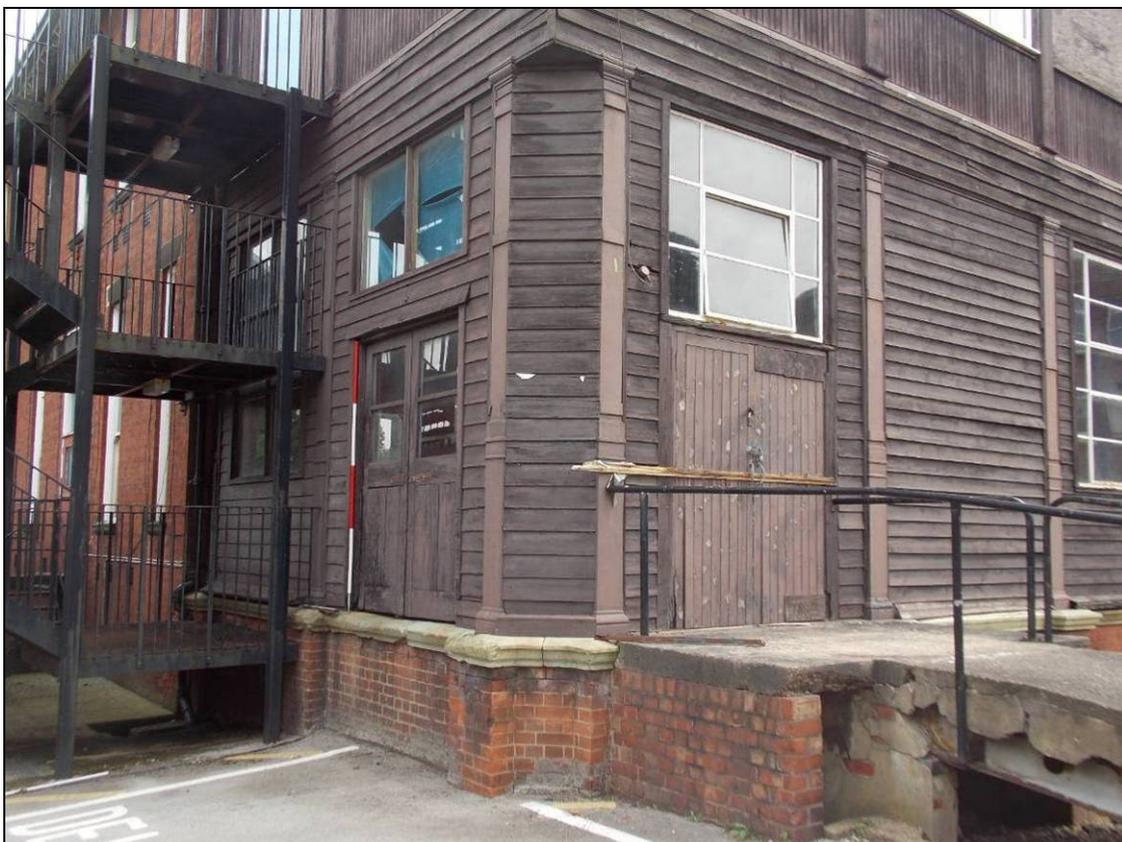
Southernmost area with cast-iron pillars over a brick plinth, looking north-east (scale 2m).
